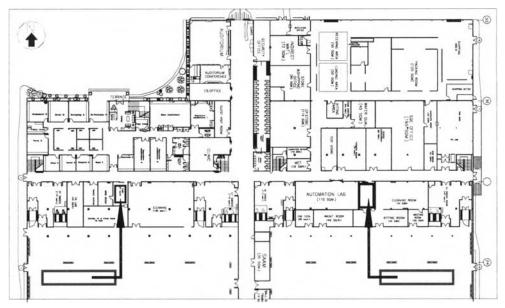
Packing Area inside Cleanroom to Cleanroom Load out area
